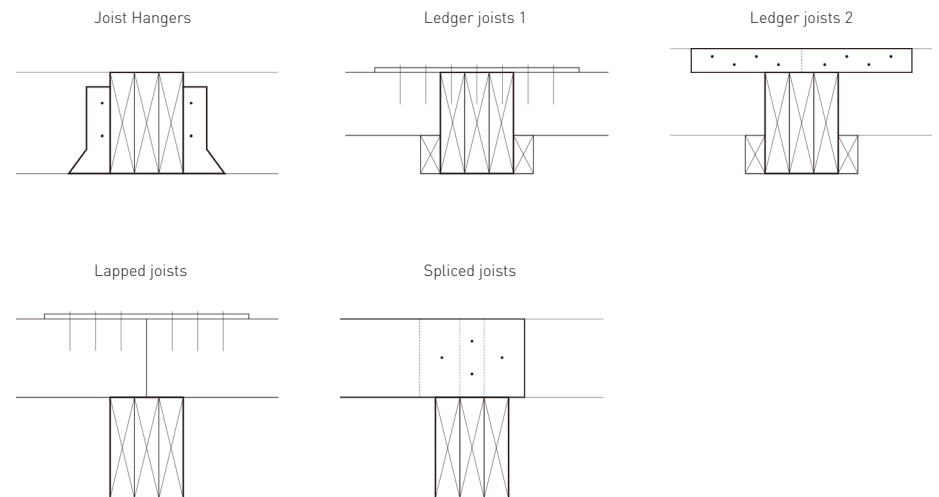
Cross section of placing joists, drawn by author (Ching, 2014)
